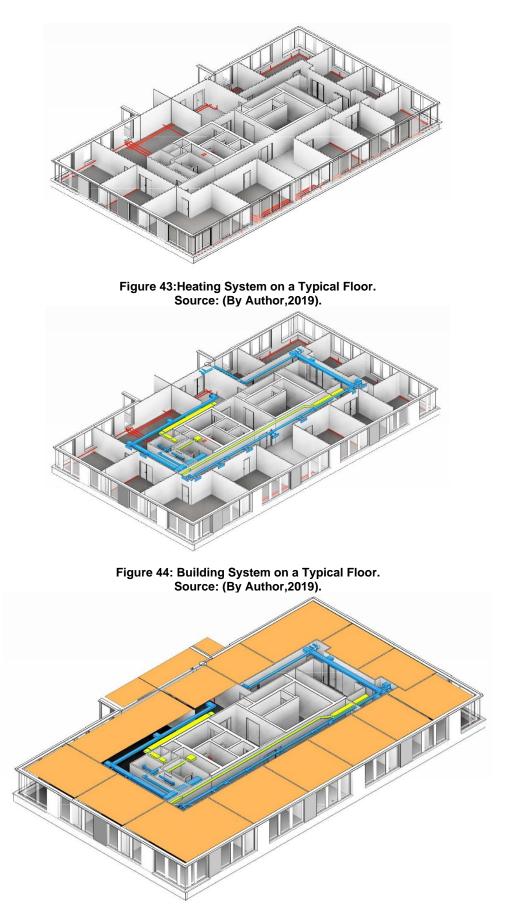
Ceiling panel & Building System on a Typical Floor. Source: (By Author,2019).
